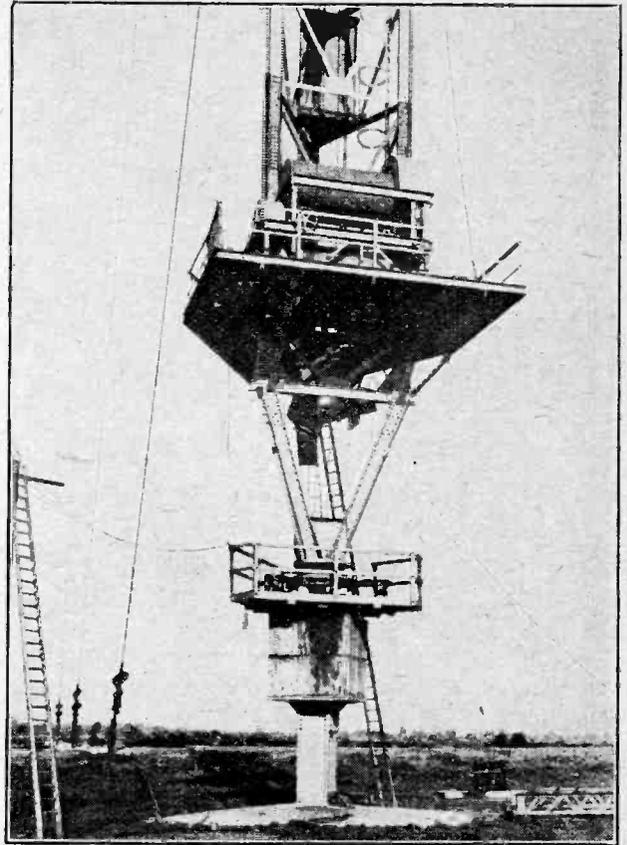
Base of one of the aerial masts, showing socket joint, base insulator and winch platform.
